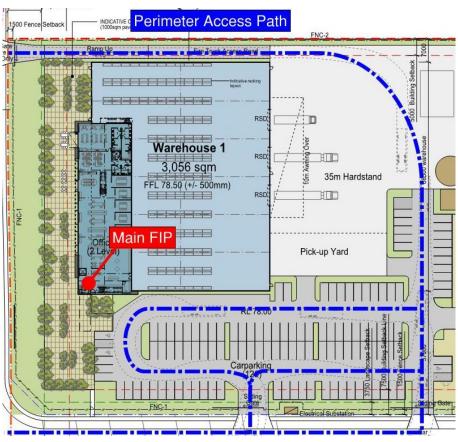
Fire Brigade Access and Site Facilities – Warehouse 1
